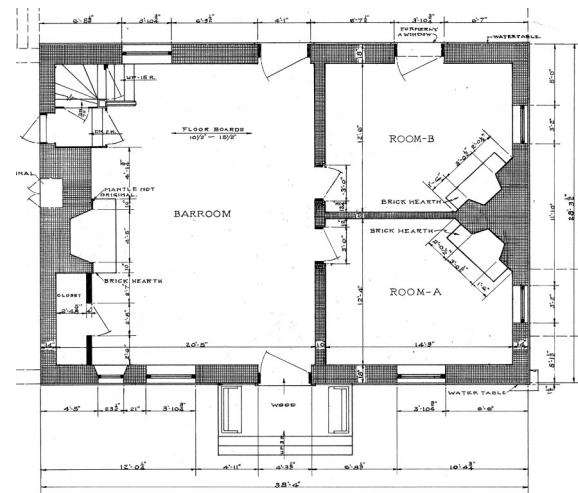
Seven Stars Tavern, Pilesgrove Township, showing the three-room layout known as the "Penn Plan."
